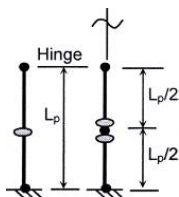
The position of the plastic hinge in the critical region of the RC girder bridge pier [4]
